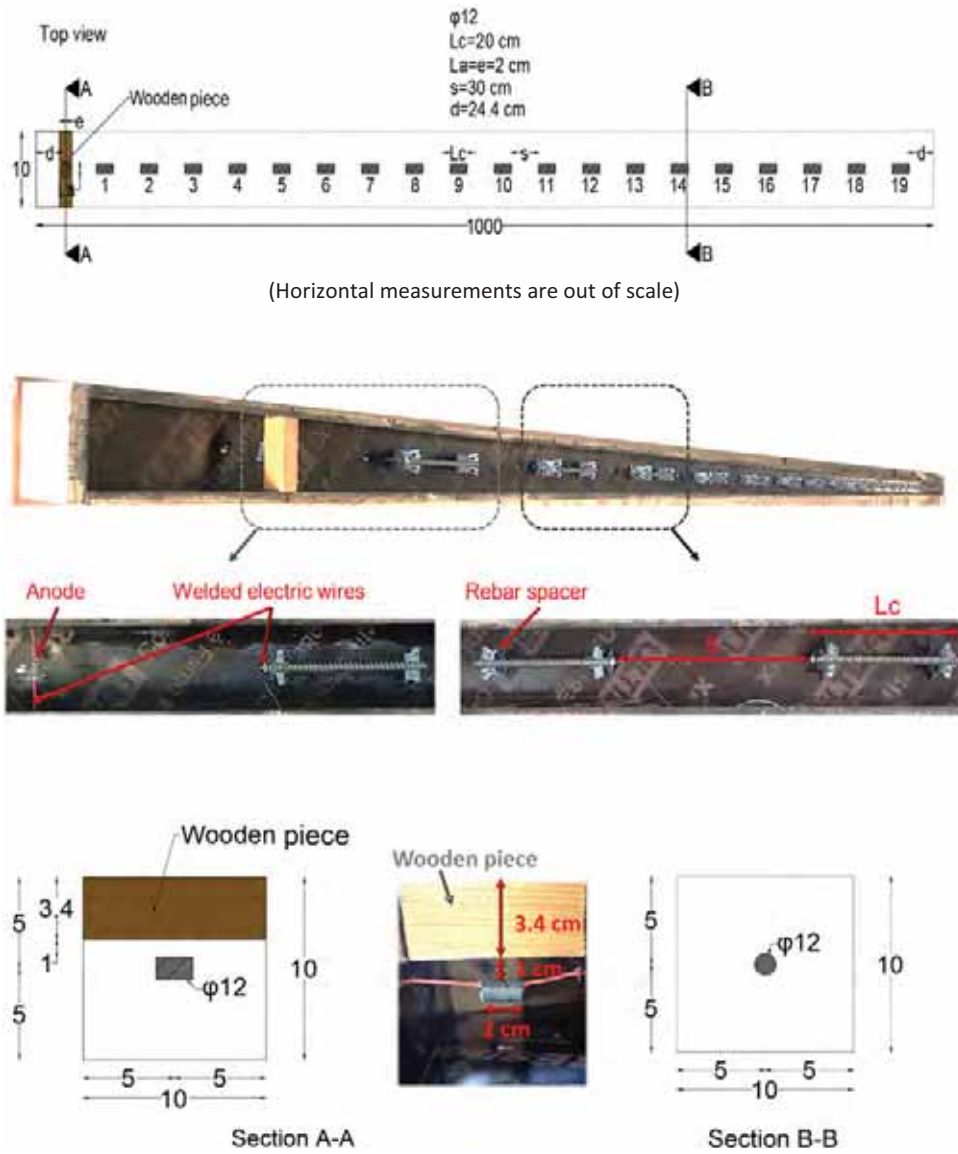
Details of reinforcement of the mortar beam (dimensions are in cm except for φ12 in mm).
